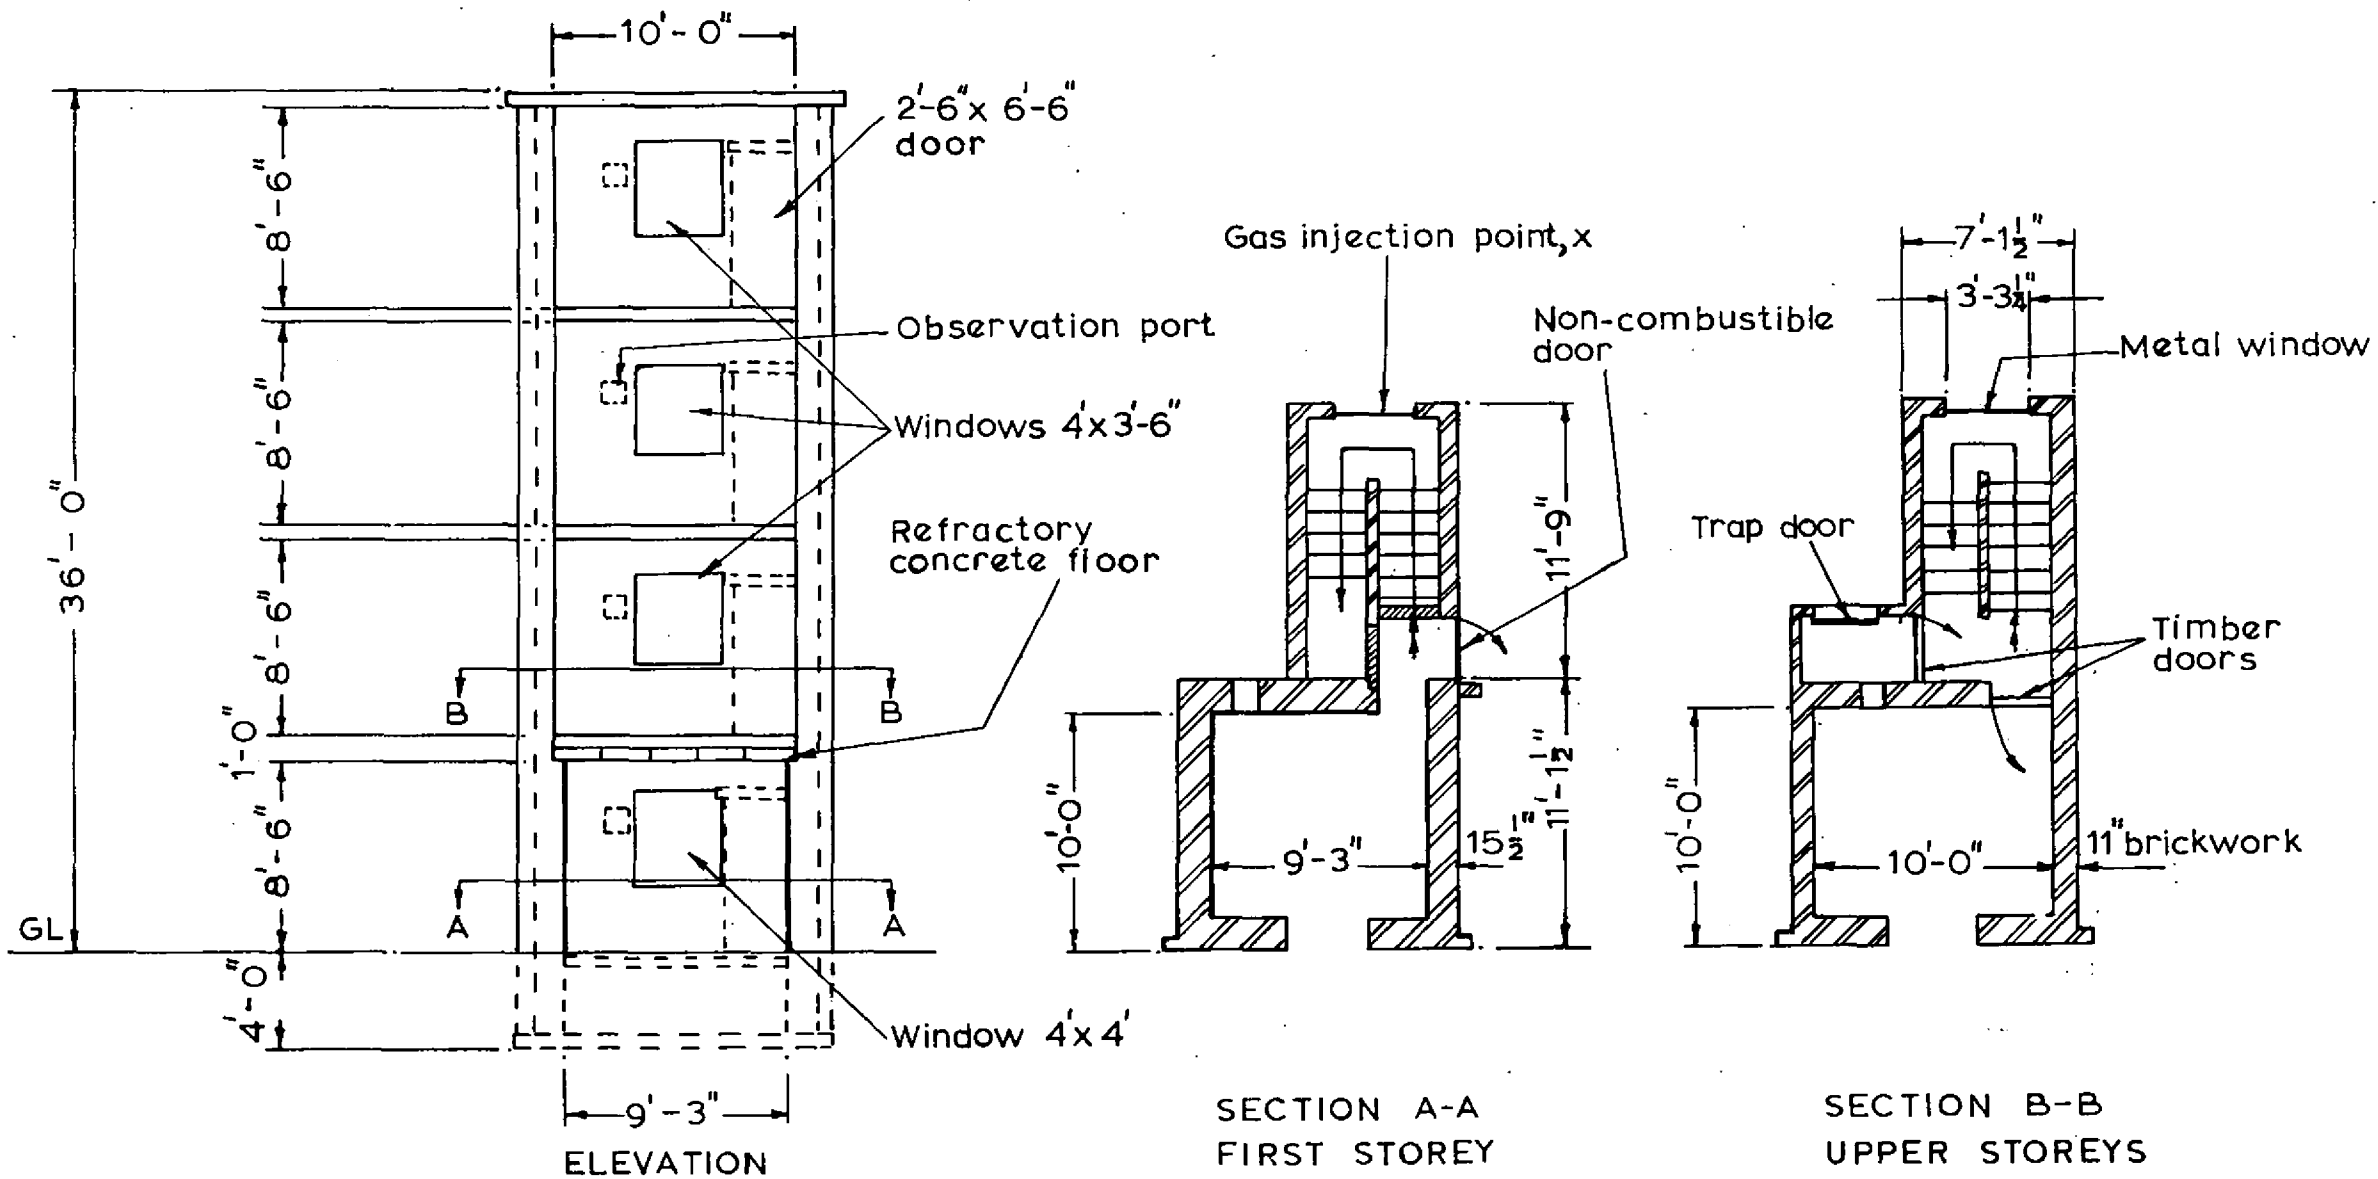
FOUR STOREY BUILDING FOR INERT GAS TESTS
